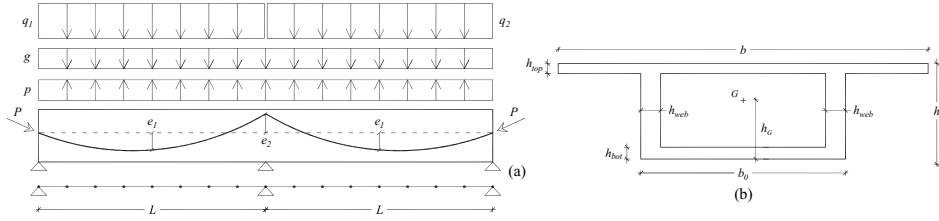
Box girder bridge undergoing damage. (a) Structural scheme and loading conditions. (b) Geometry of the box cross-section.
